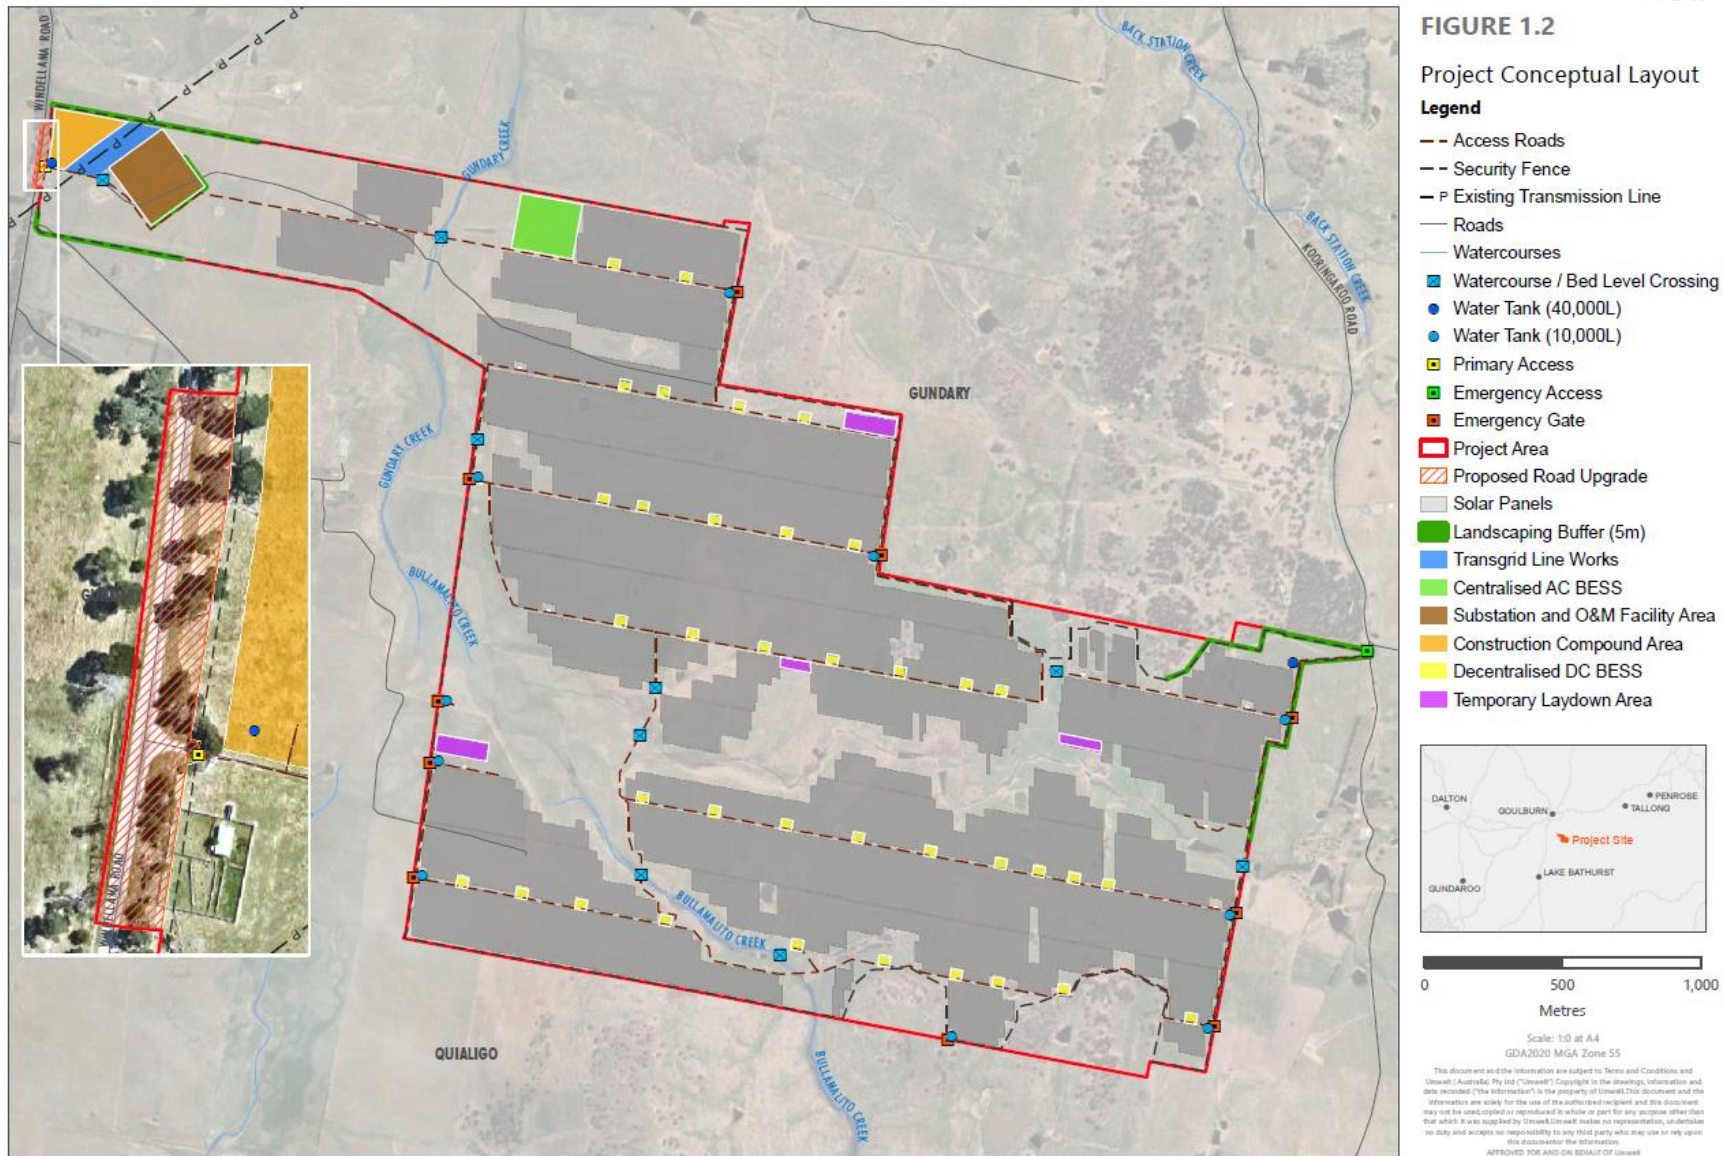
Gundry Solar Farm – Preliminary Project Site Layout
